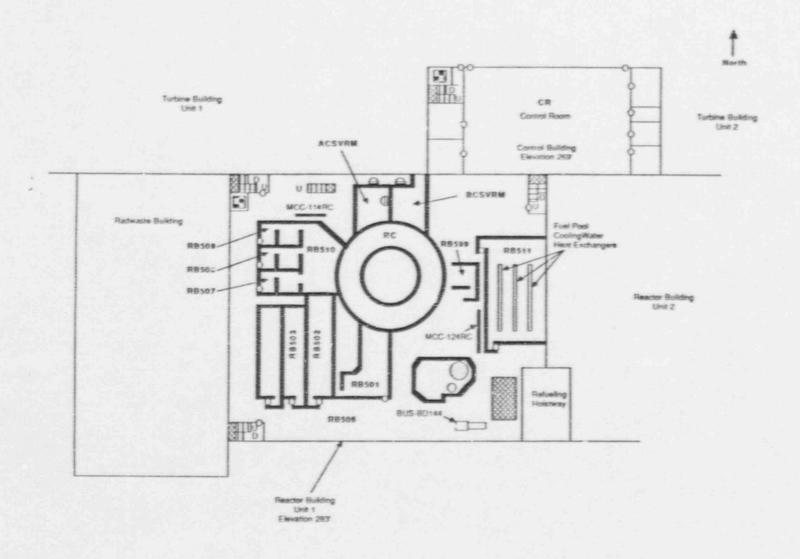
Limerick 1 General Arrangement, Elevations 269' and 283'
